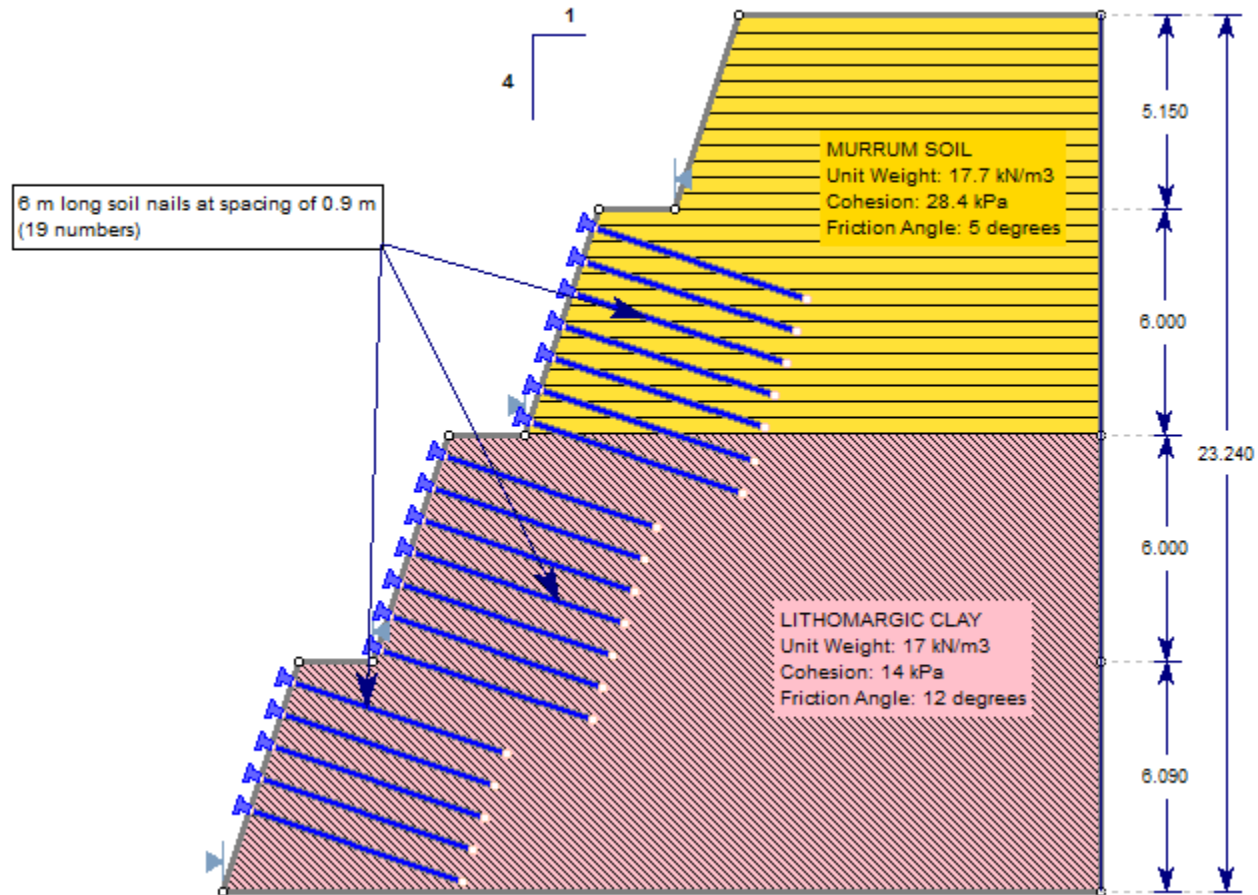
Cross-section of slope at 160.020 with remedial measure, providing 19 numbers of soil nails of 6 m length at spacing of 0.9m
